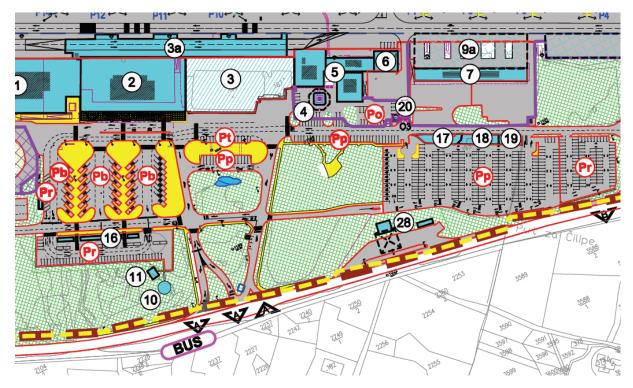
Layout plan of the Dubrovnik Airport parking areas Source: Urban Development Plan (UDP 2016)
